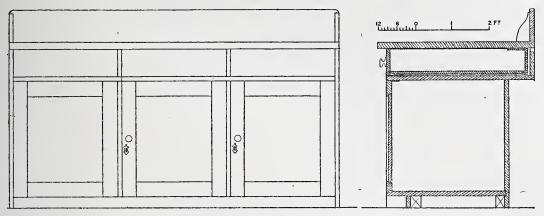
STUDENTS' WORKING BENCHES IN ELECTRICAL LABORATORY, FIG. 1, A.
